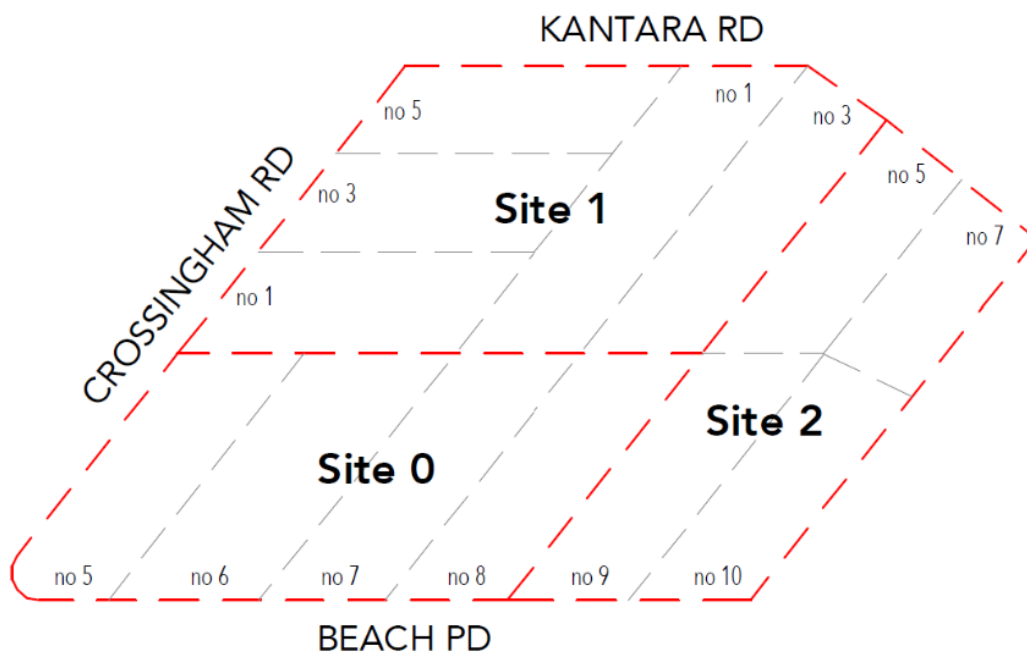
Site plan of proposed development site amalgamation of the subject site (Site and Site 2) and Site O (5-8 Beach Parade) (Source: Think Planners)
